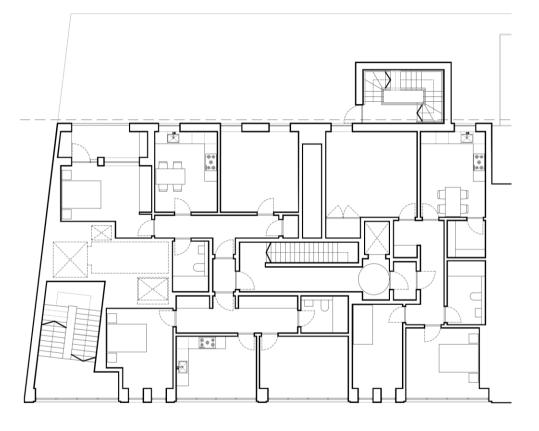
Proposed first floor plan illustrating the residential dwellings.
